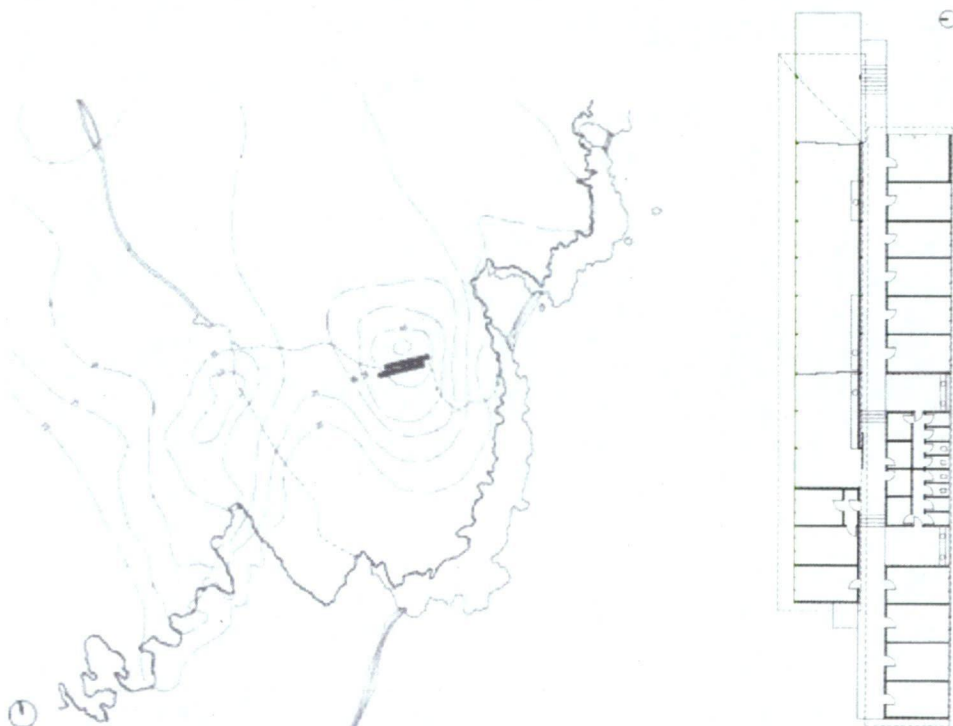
& 7.4 – Bay of Fires Lodge, site plan and floor plan
